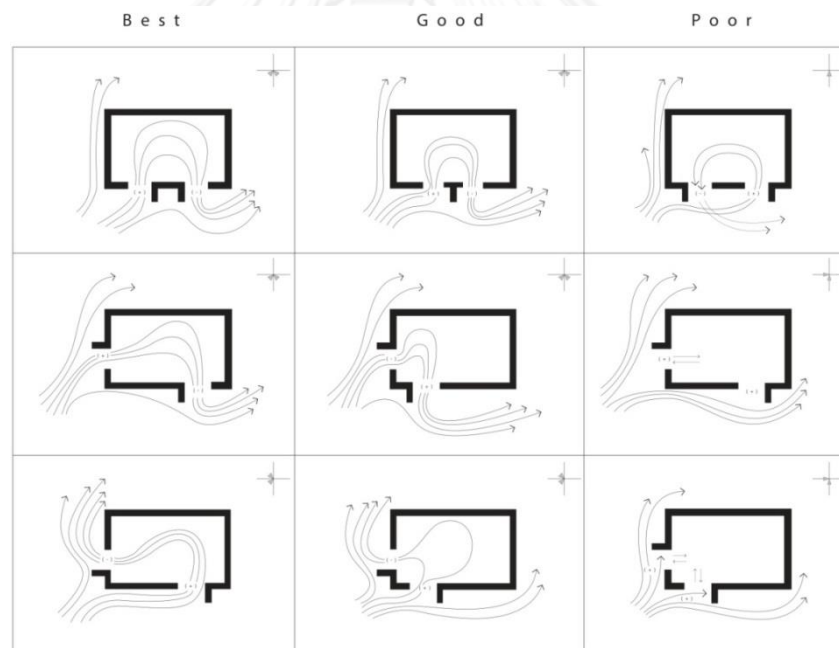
Diagrams of wing wall design strategies show different location of apertures on adjacent walls or on the same wall (Brown and Dekay, 2011)
